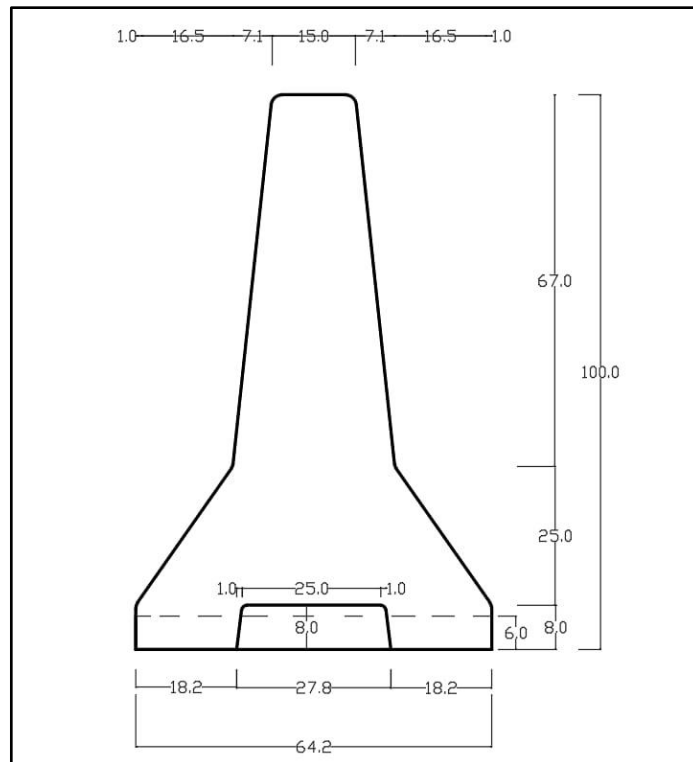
Concrete road barriers cross section (units are centimeters)
